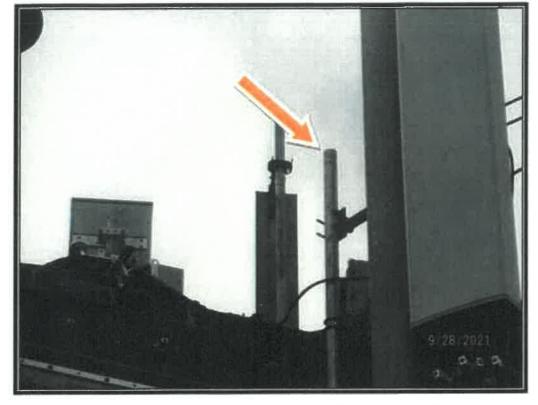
Proposed Location of G3 RAYCAP SPD on Existing Mast Pipe
